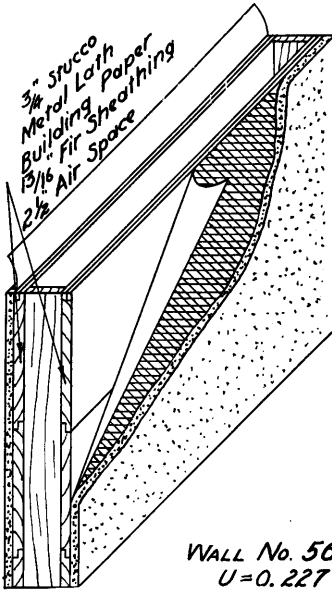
SECTIONAL VIEWS OF TEST WALLS
